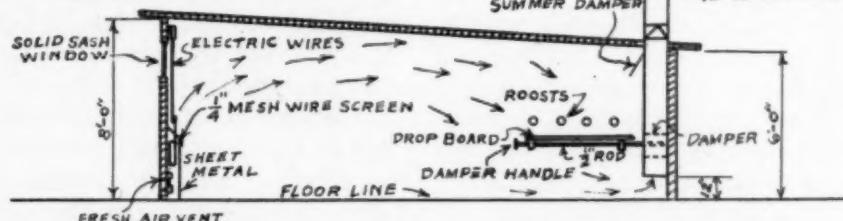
Showing a Plan of Ventilating a Poultry House by Use of an Automatic Roof Ventilator. The Method Used Is Very Similar to That Used for Dairy Barns
